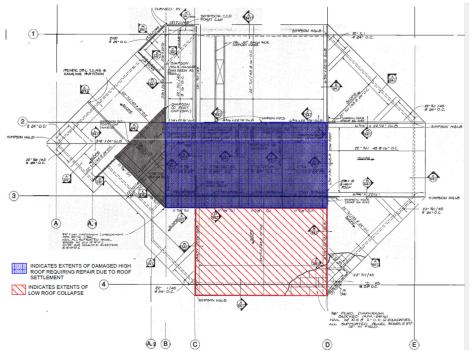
Existing building roof plan with a summary of the damage observed during PND's site visit.
